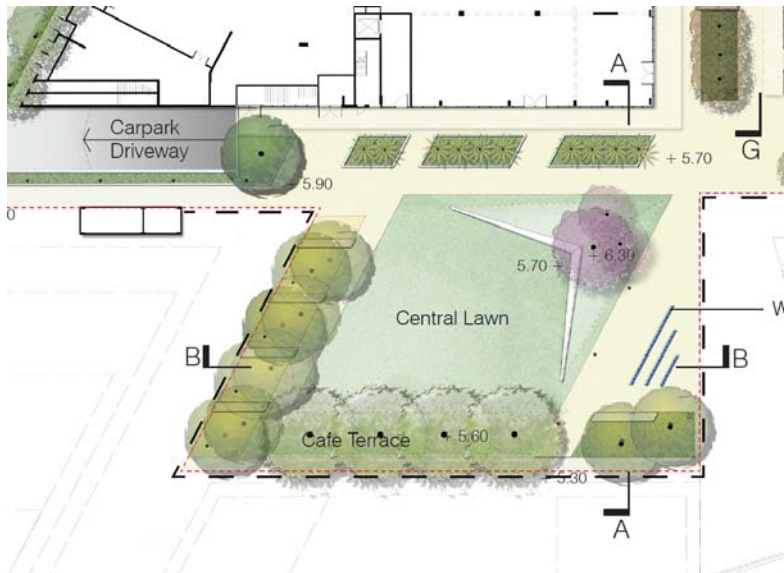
Extract of proposed 'modified' landscape plan for Neighbourhood Park
